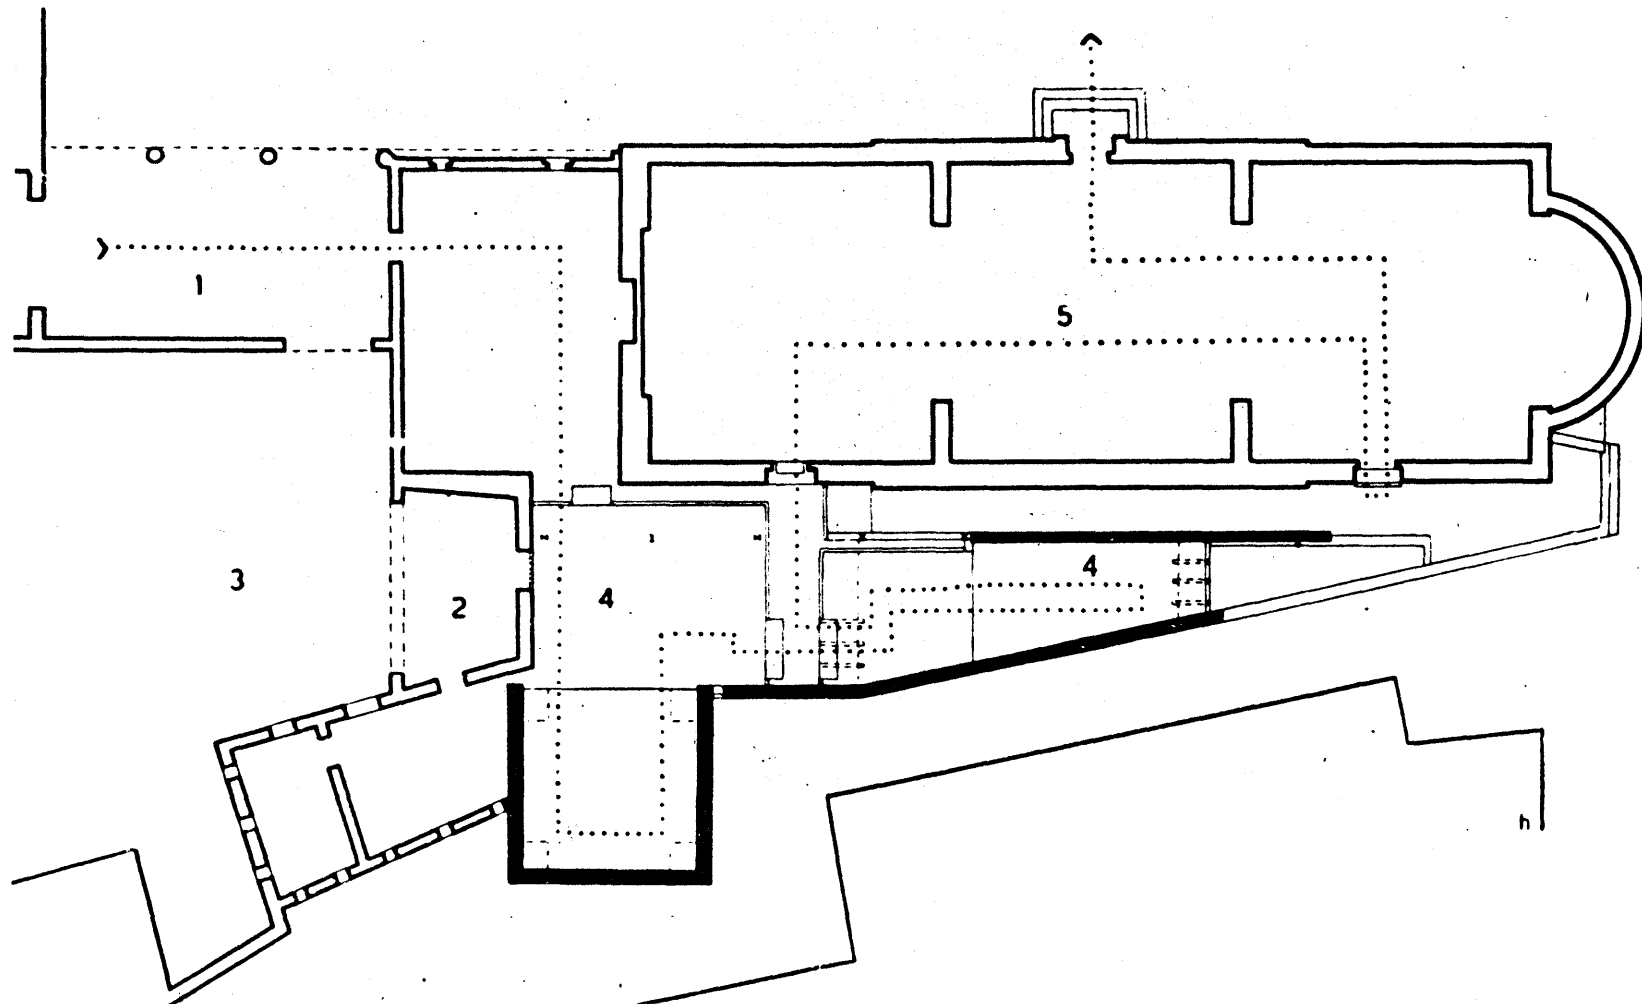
Plan of the basilica, surrounding buildings and the addition.
